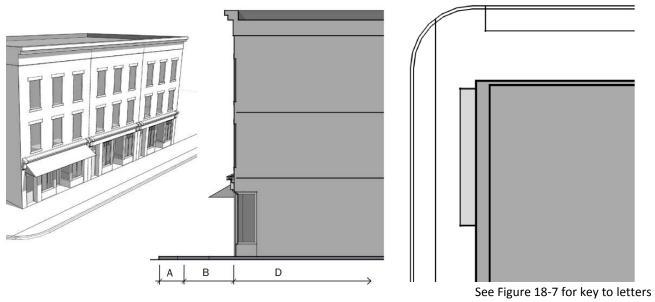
Illustrative View, Section View, and Plan View of Storefront Frontage Type
